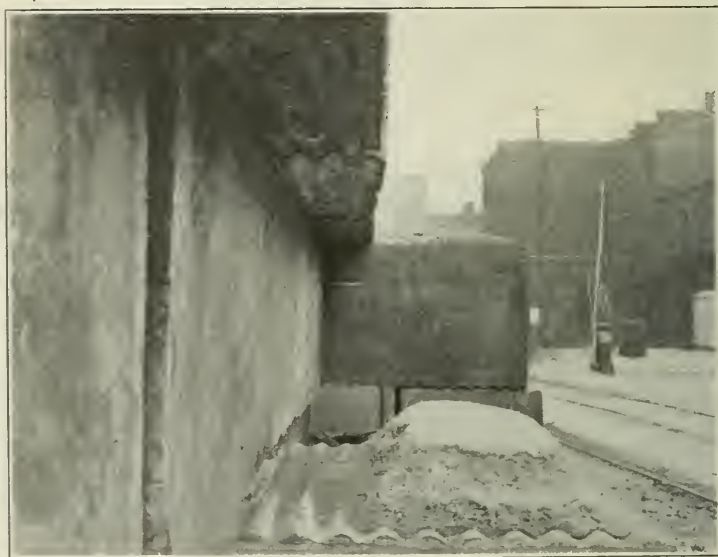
Block Retaining Wall, Showing Detail of Joints.
